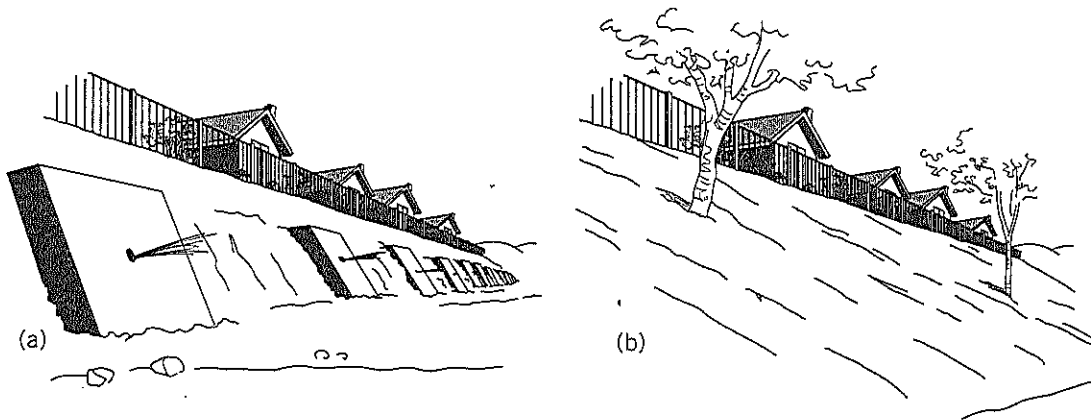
Example of precast concrete panels attached to an anchor block wall to improve aesthetics (Schnabel Foundation Company patented system).
